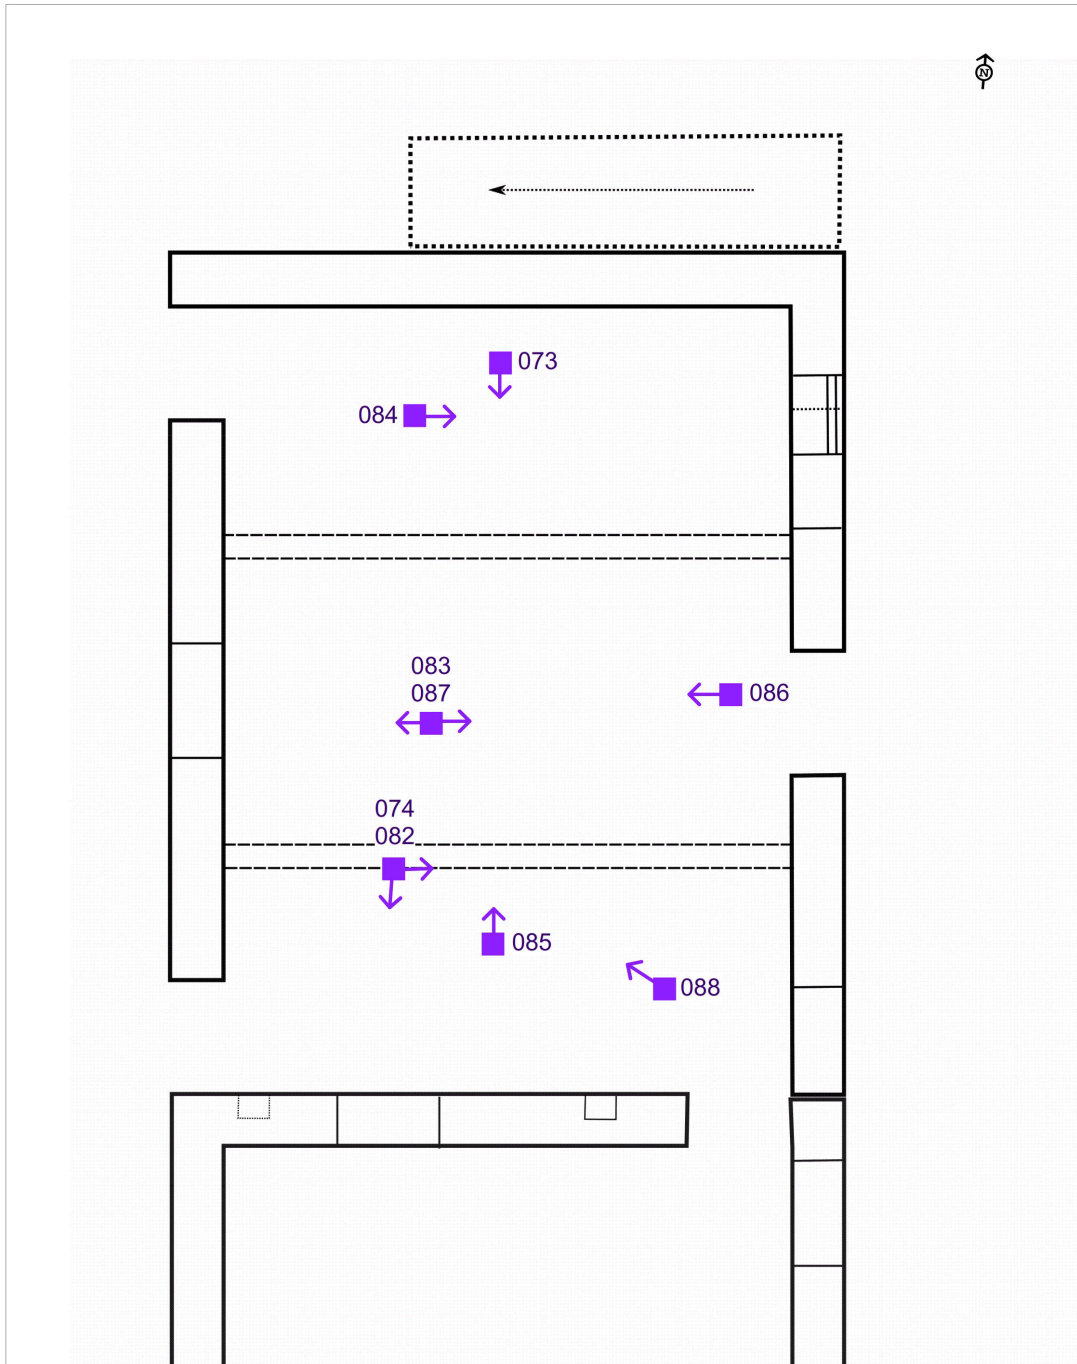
Location of photographs inside the ground floor of the cow house within the Llan y Nant Barn complex.
